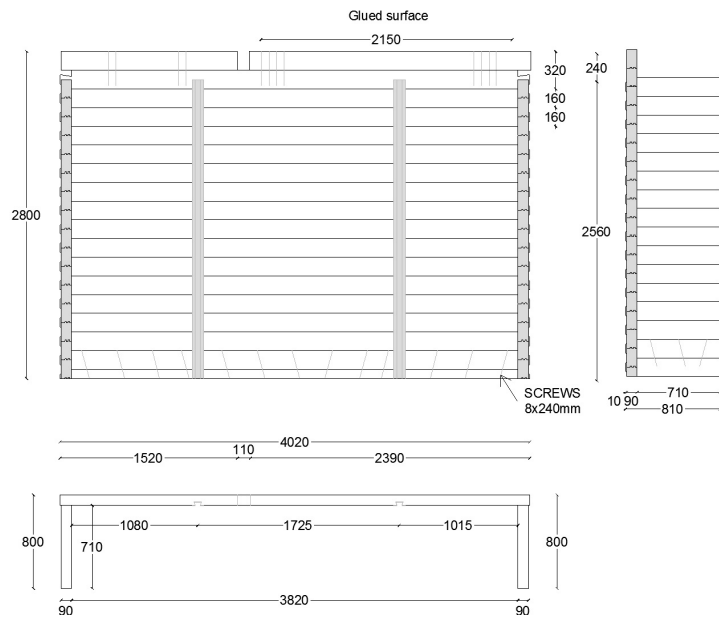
Dimension of M/C_TR wall specimen.
